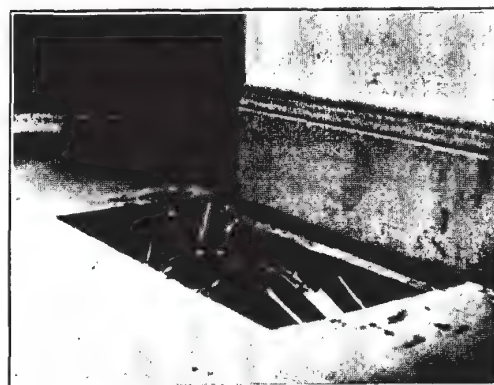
SHOWING METHOD OF BUILDING-UP CABLES.
